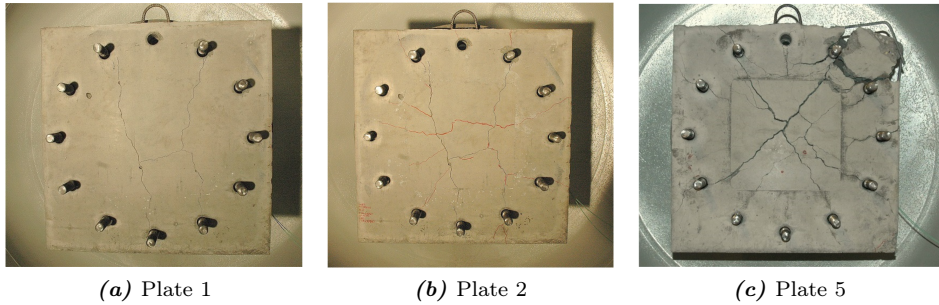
Plate 1, 2 and 5 after testing in the shock tube.
